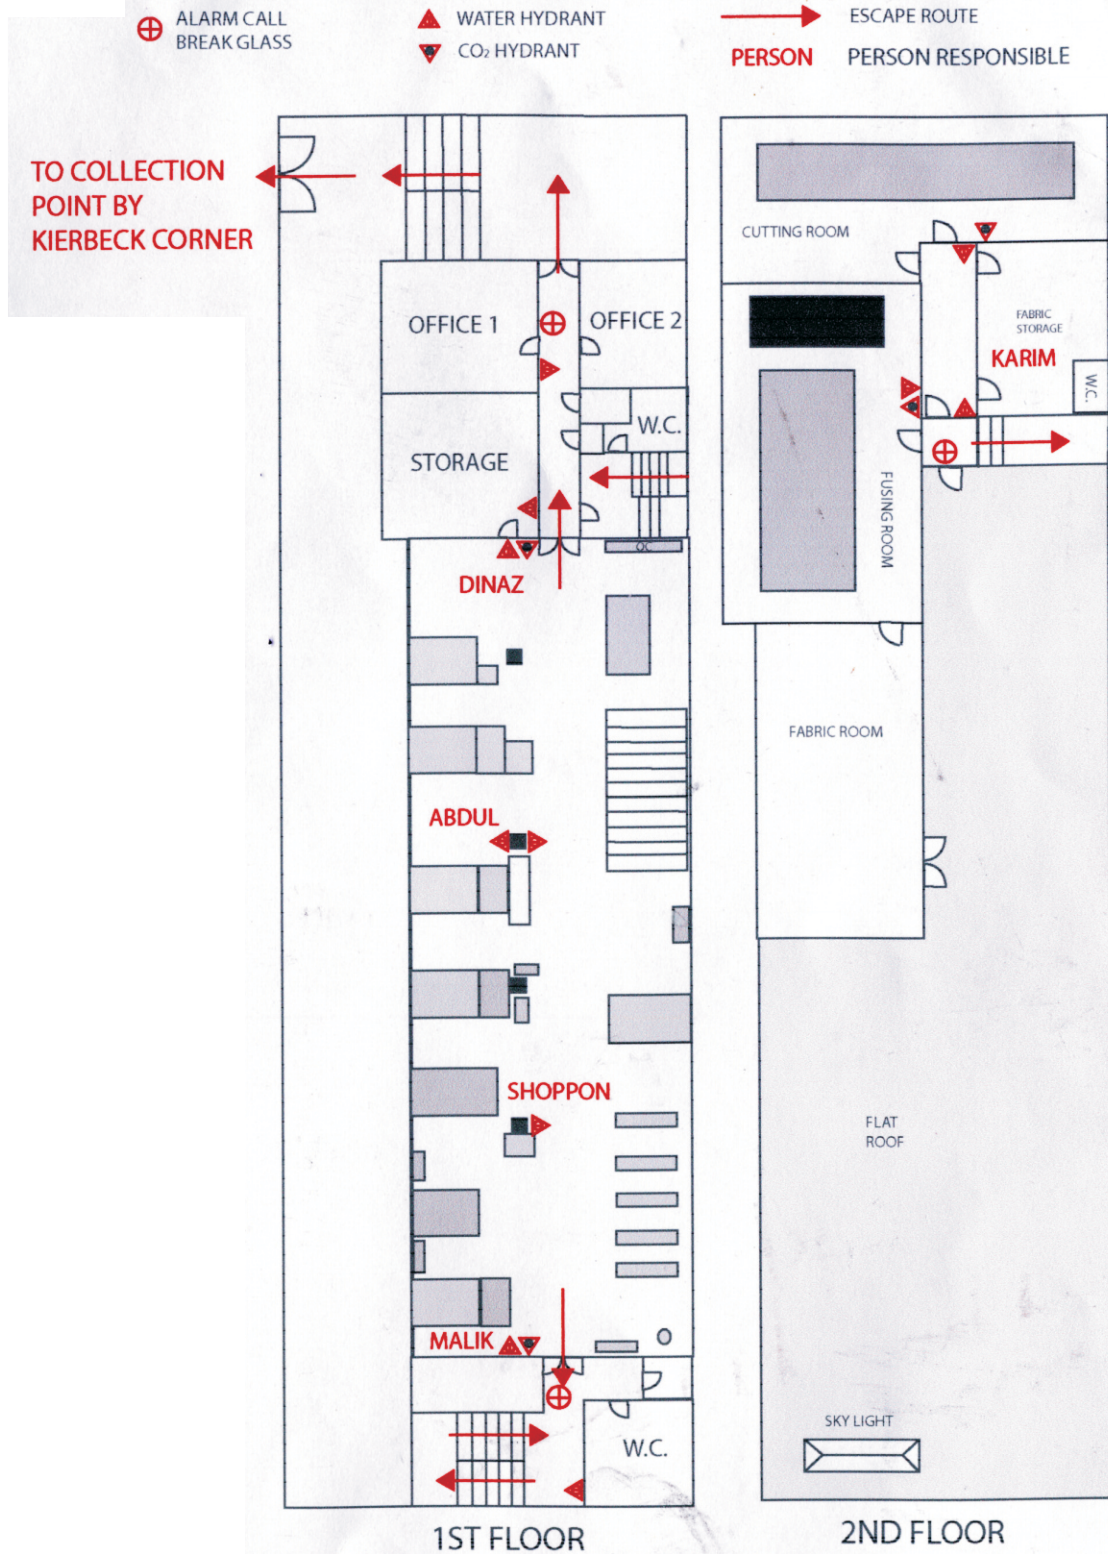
An emergency fire drill plan of the upper ground and 1st floors
